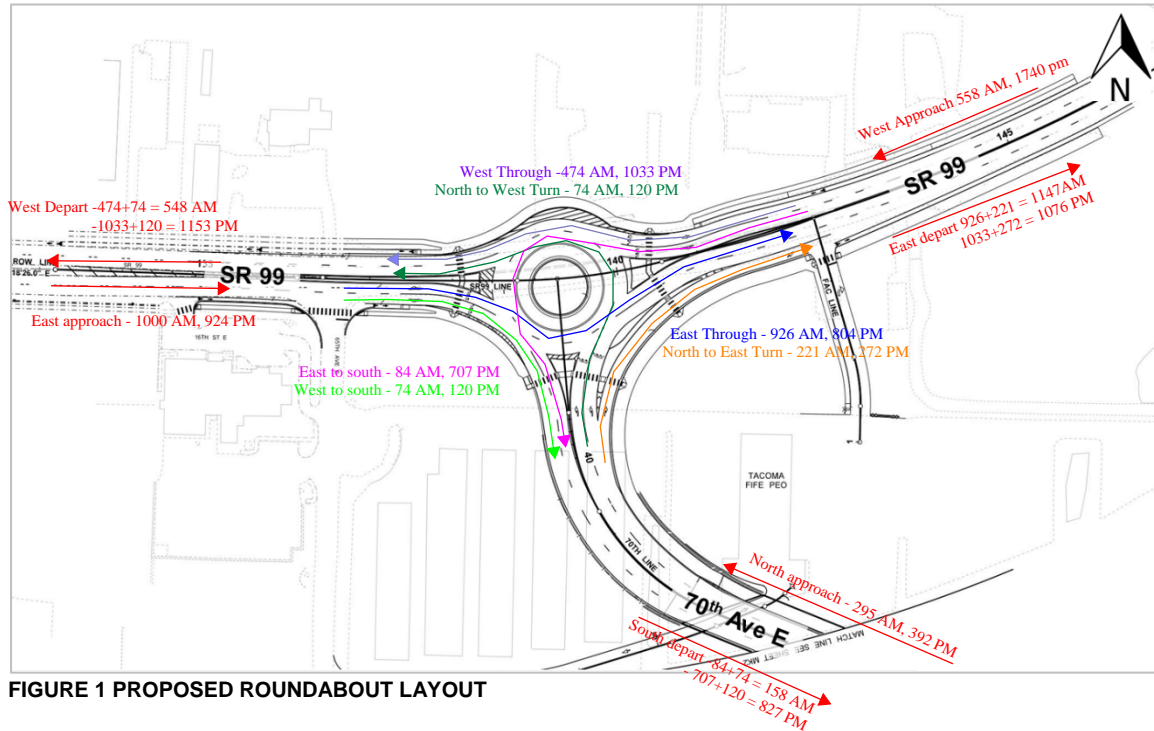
PROPOSED ROUNDABOUT LAYOUT
